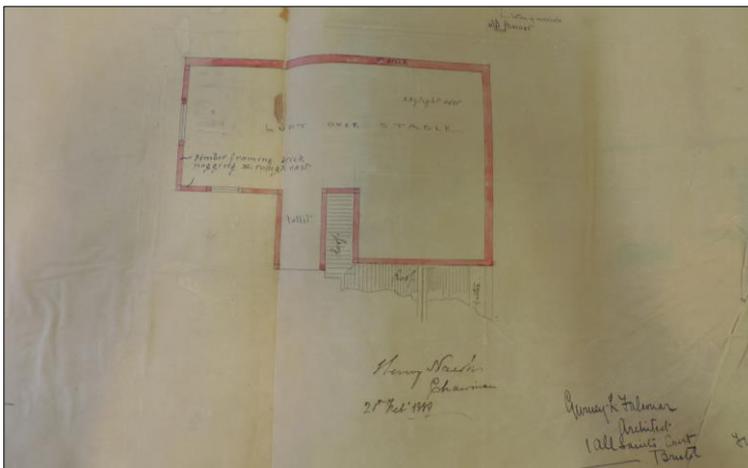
Original building plan for the proposed Stable dated 1889, commissioned by Dr A E Blacker, loft over Stable. (BRO ref BUILDING PLAN/Vol 24/ 12a)
